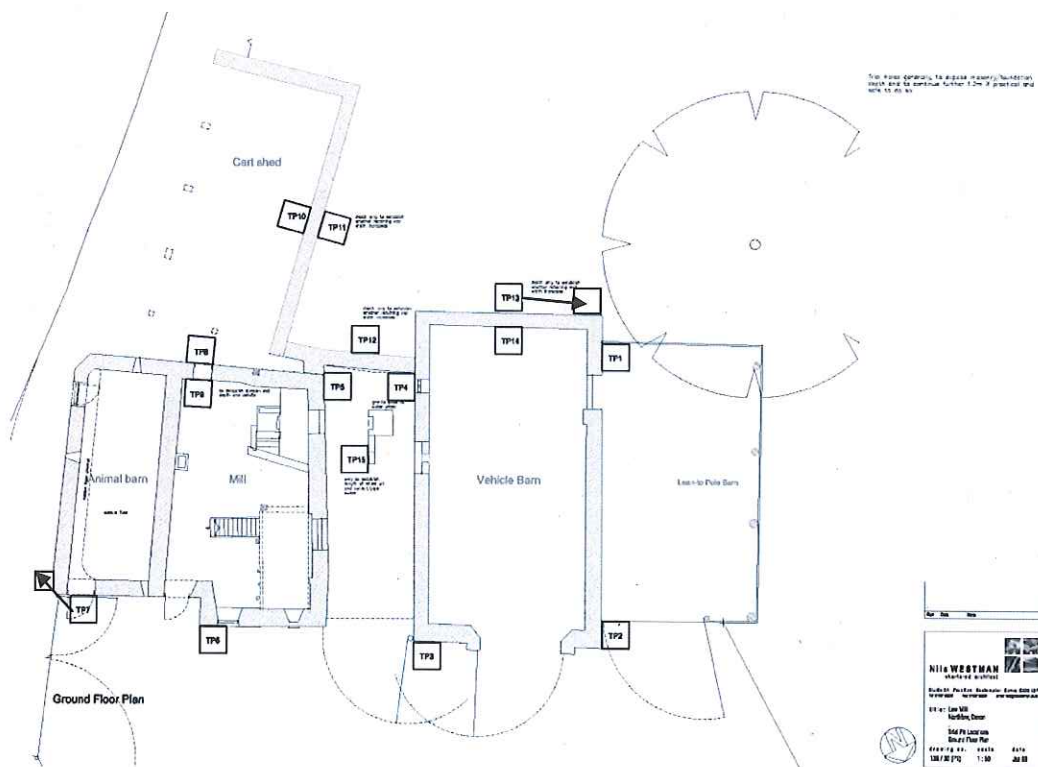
Figure A: Lew Mill: positions of test pits. Plan courtesy of Nils Westman Architects
